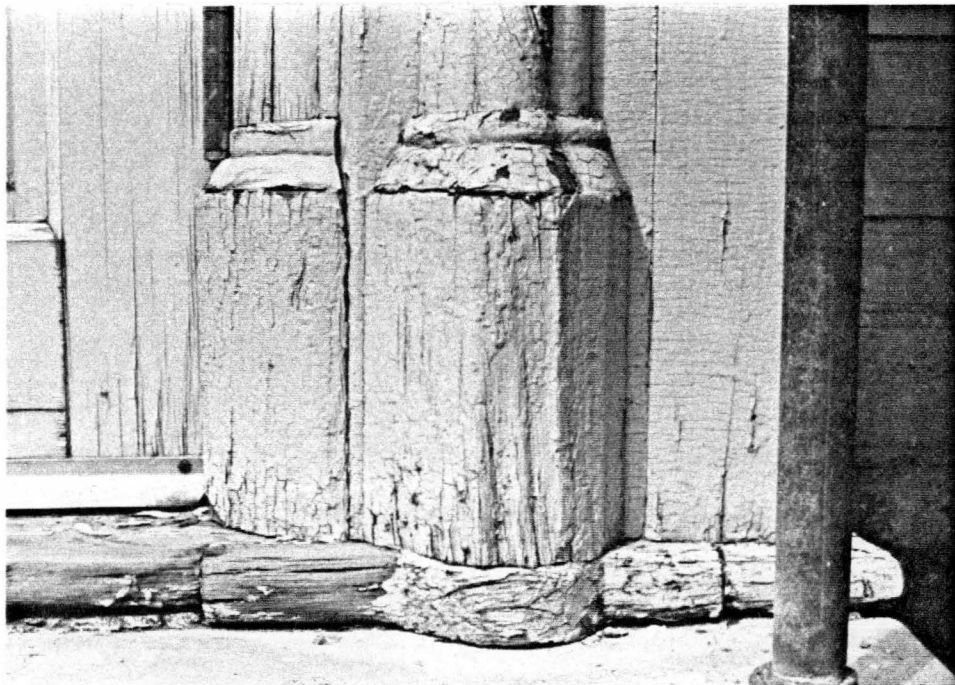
Plinths of entrance door pilasters. South elevation.
